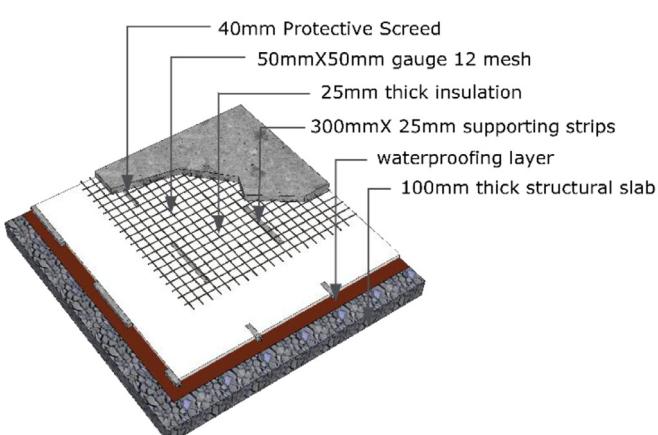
The newly designed system with discontinuous supporting strips [42].
